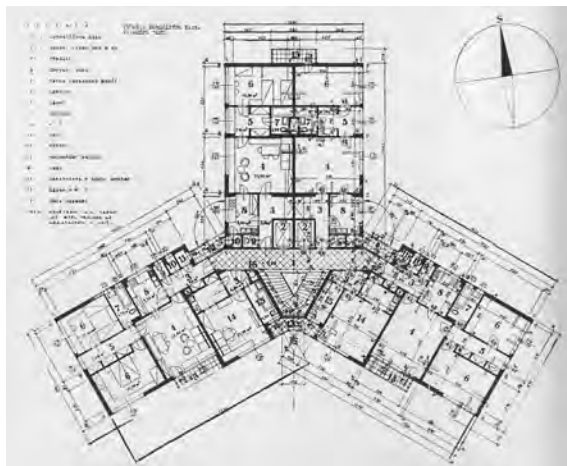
JOSEF HAVLÍČEK, PLAN OF TOWER FOR MODEL HOUSING DEVELOPMENT IN KLDNO, 1947.
